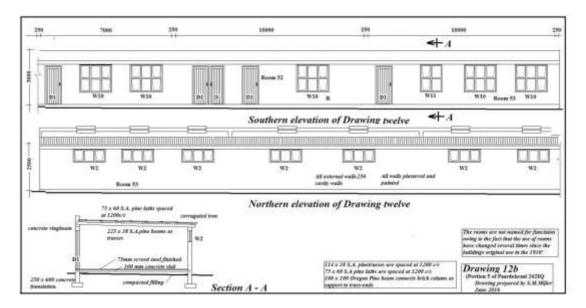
Above. Northern and Southern elevations of the building captured in Drawing 12. (*Drawing S.M. Miller 2016.*)
